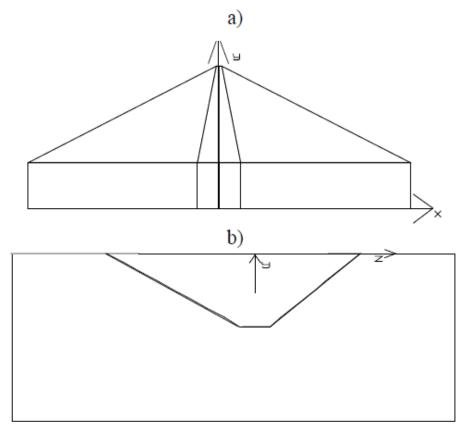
Dam models with foundation: transverse - a; longitudinal (in a canyon) - b
